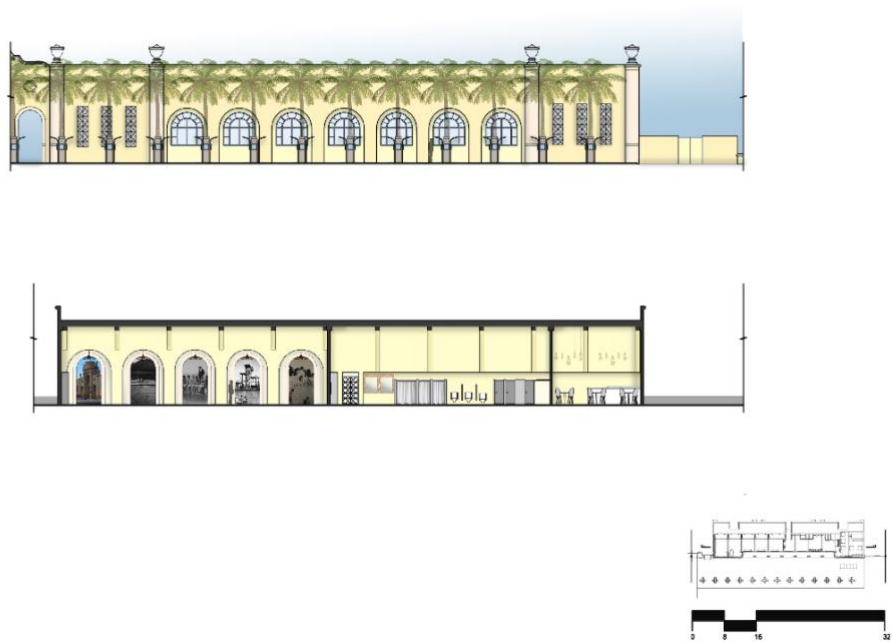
New Elevation + Longitudinal Section – Ewa Side
